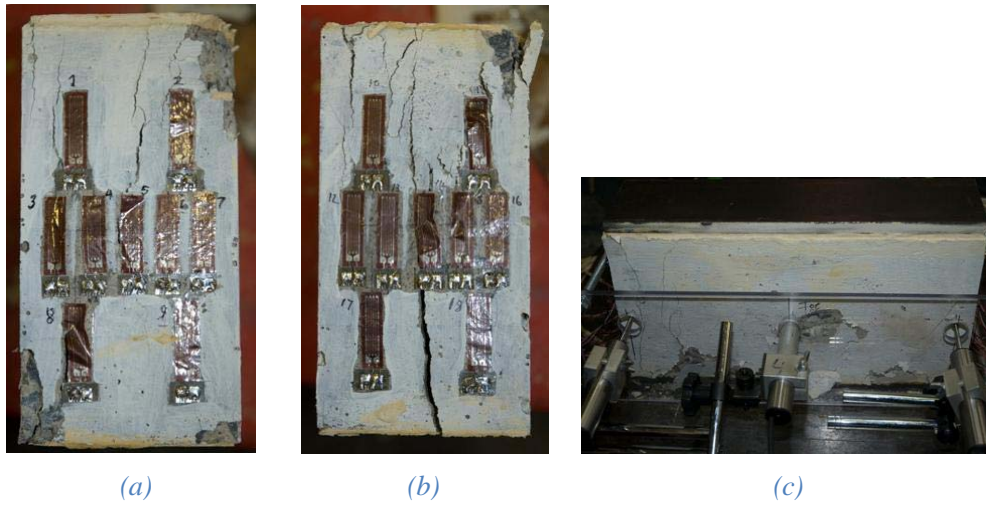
Failure pattern of concrete prism Test9-75; (a) and (b) front view; (c) side view
